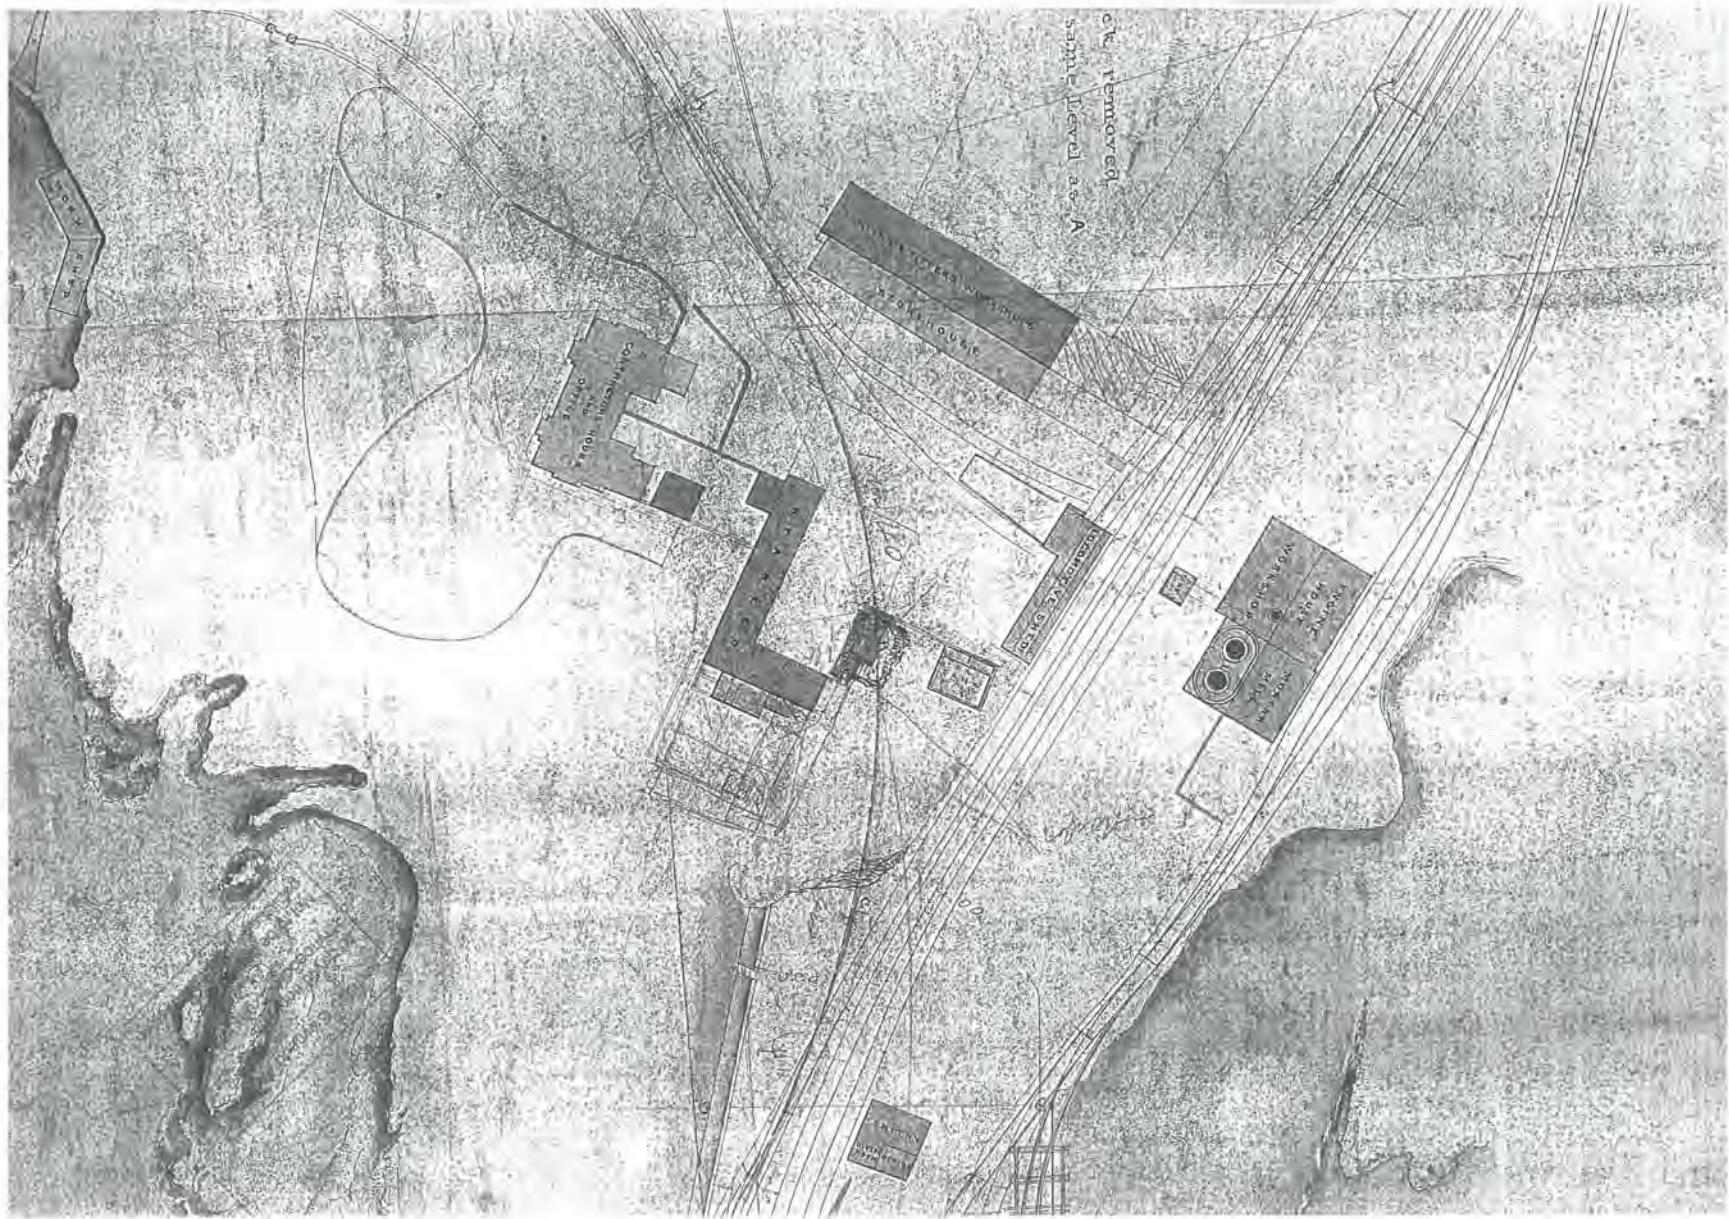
Late 19th century plan of Soldier's Point at the landward end of the breakwater showing the structures and tramway located on it (Gwynedd Archives; X/LNWR/356).
